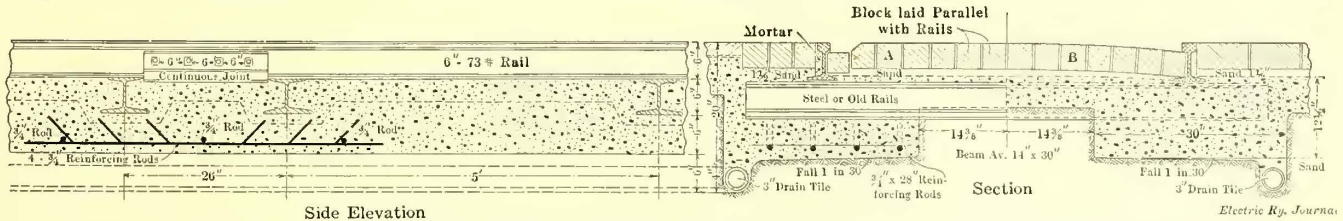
Ft. Wayne & Wabash Valley—Proposed Standard Reinforced Concrete Construction with Steel Ties
